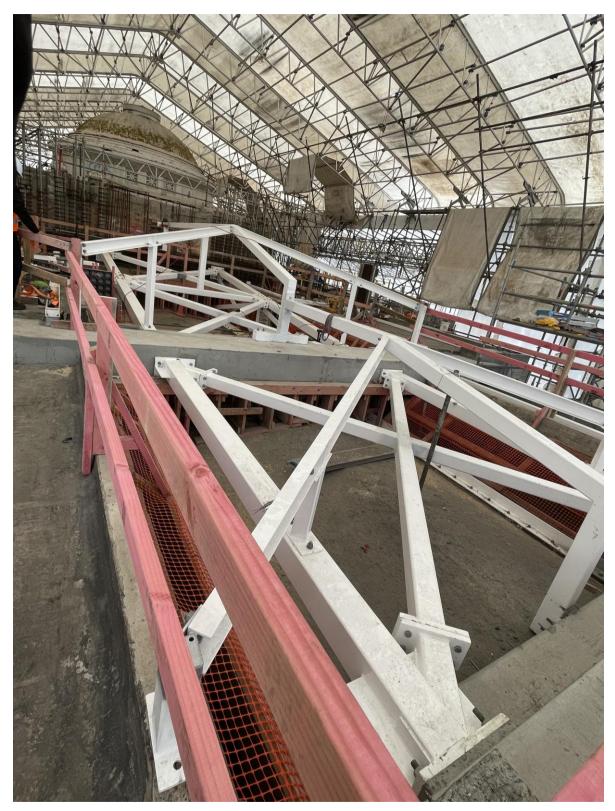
Roof steelwork and steel truss bracings over West Wing.
